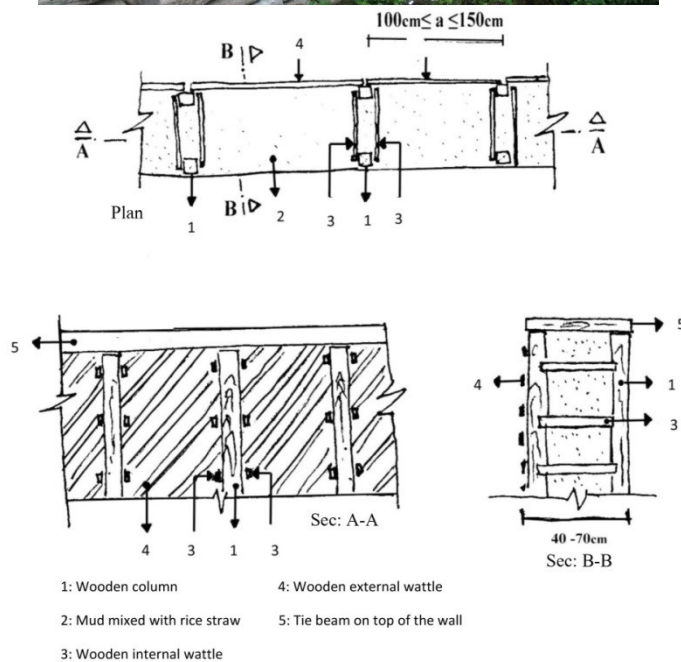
Detail of wall in timber frame technology (*larde*) belongs to the vernacular construction.
